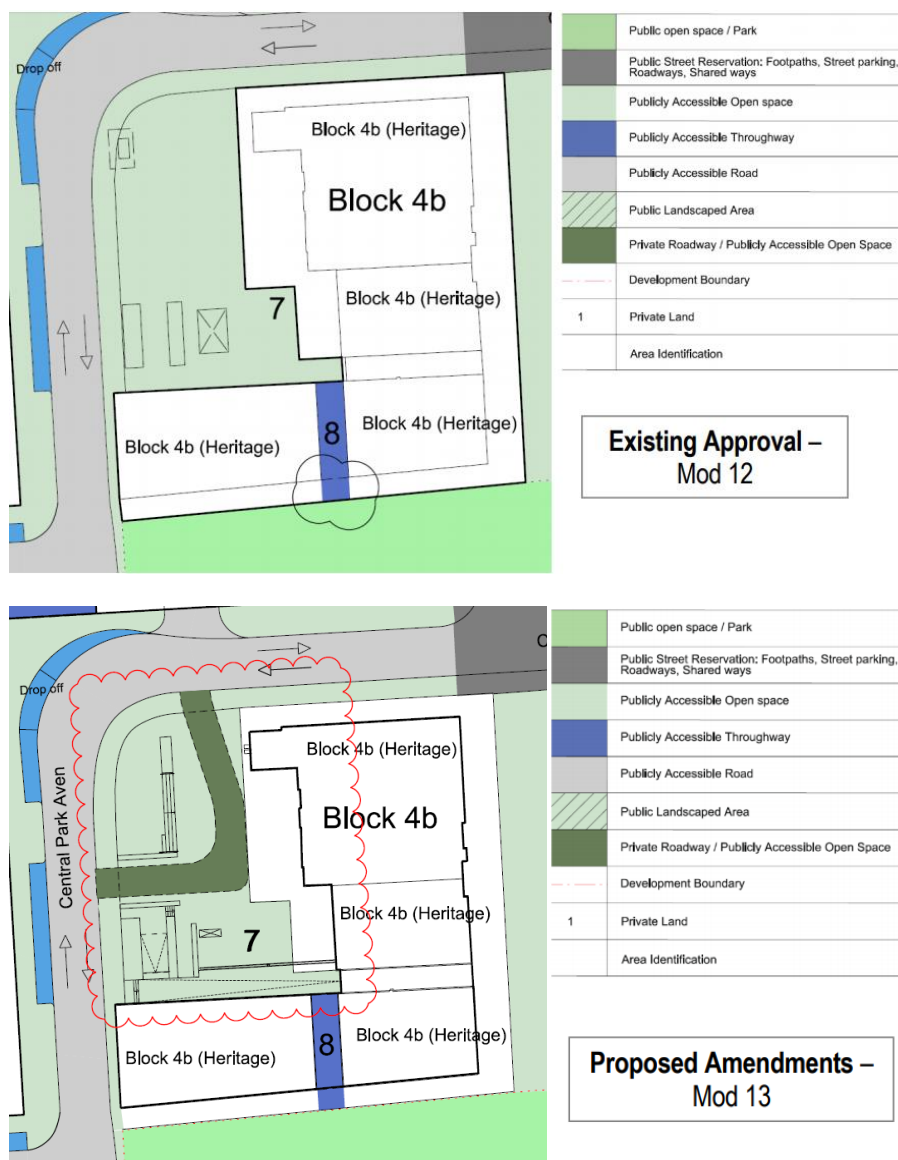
Approved and proposed Public Domain Plan (A-1254)
